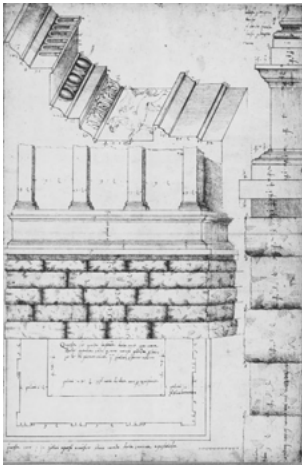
Spoleto, Torre Sacello: sixteenth-century drawing by Andrea Palladio, London, R.I.B.A. (photo: Courtauld Institute). The sheet shows the plan, elevation and a detail of the elevation; the entablature drawn at the top is unrelated.
